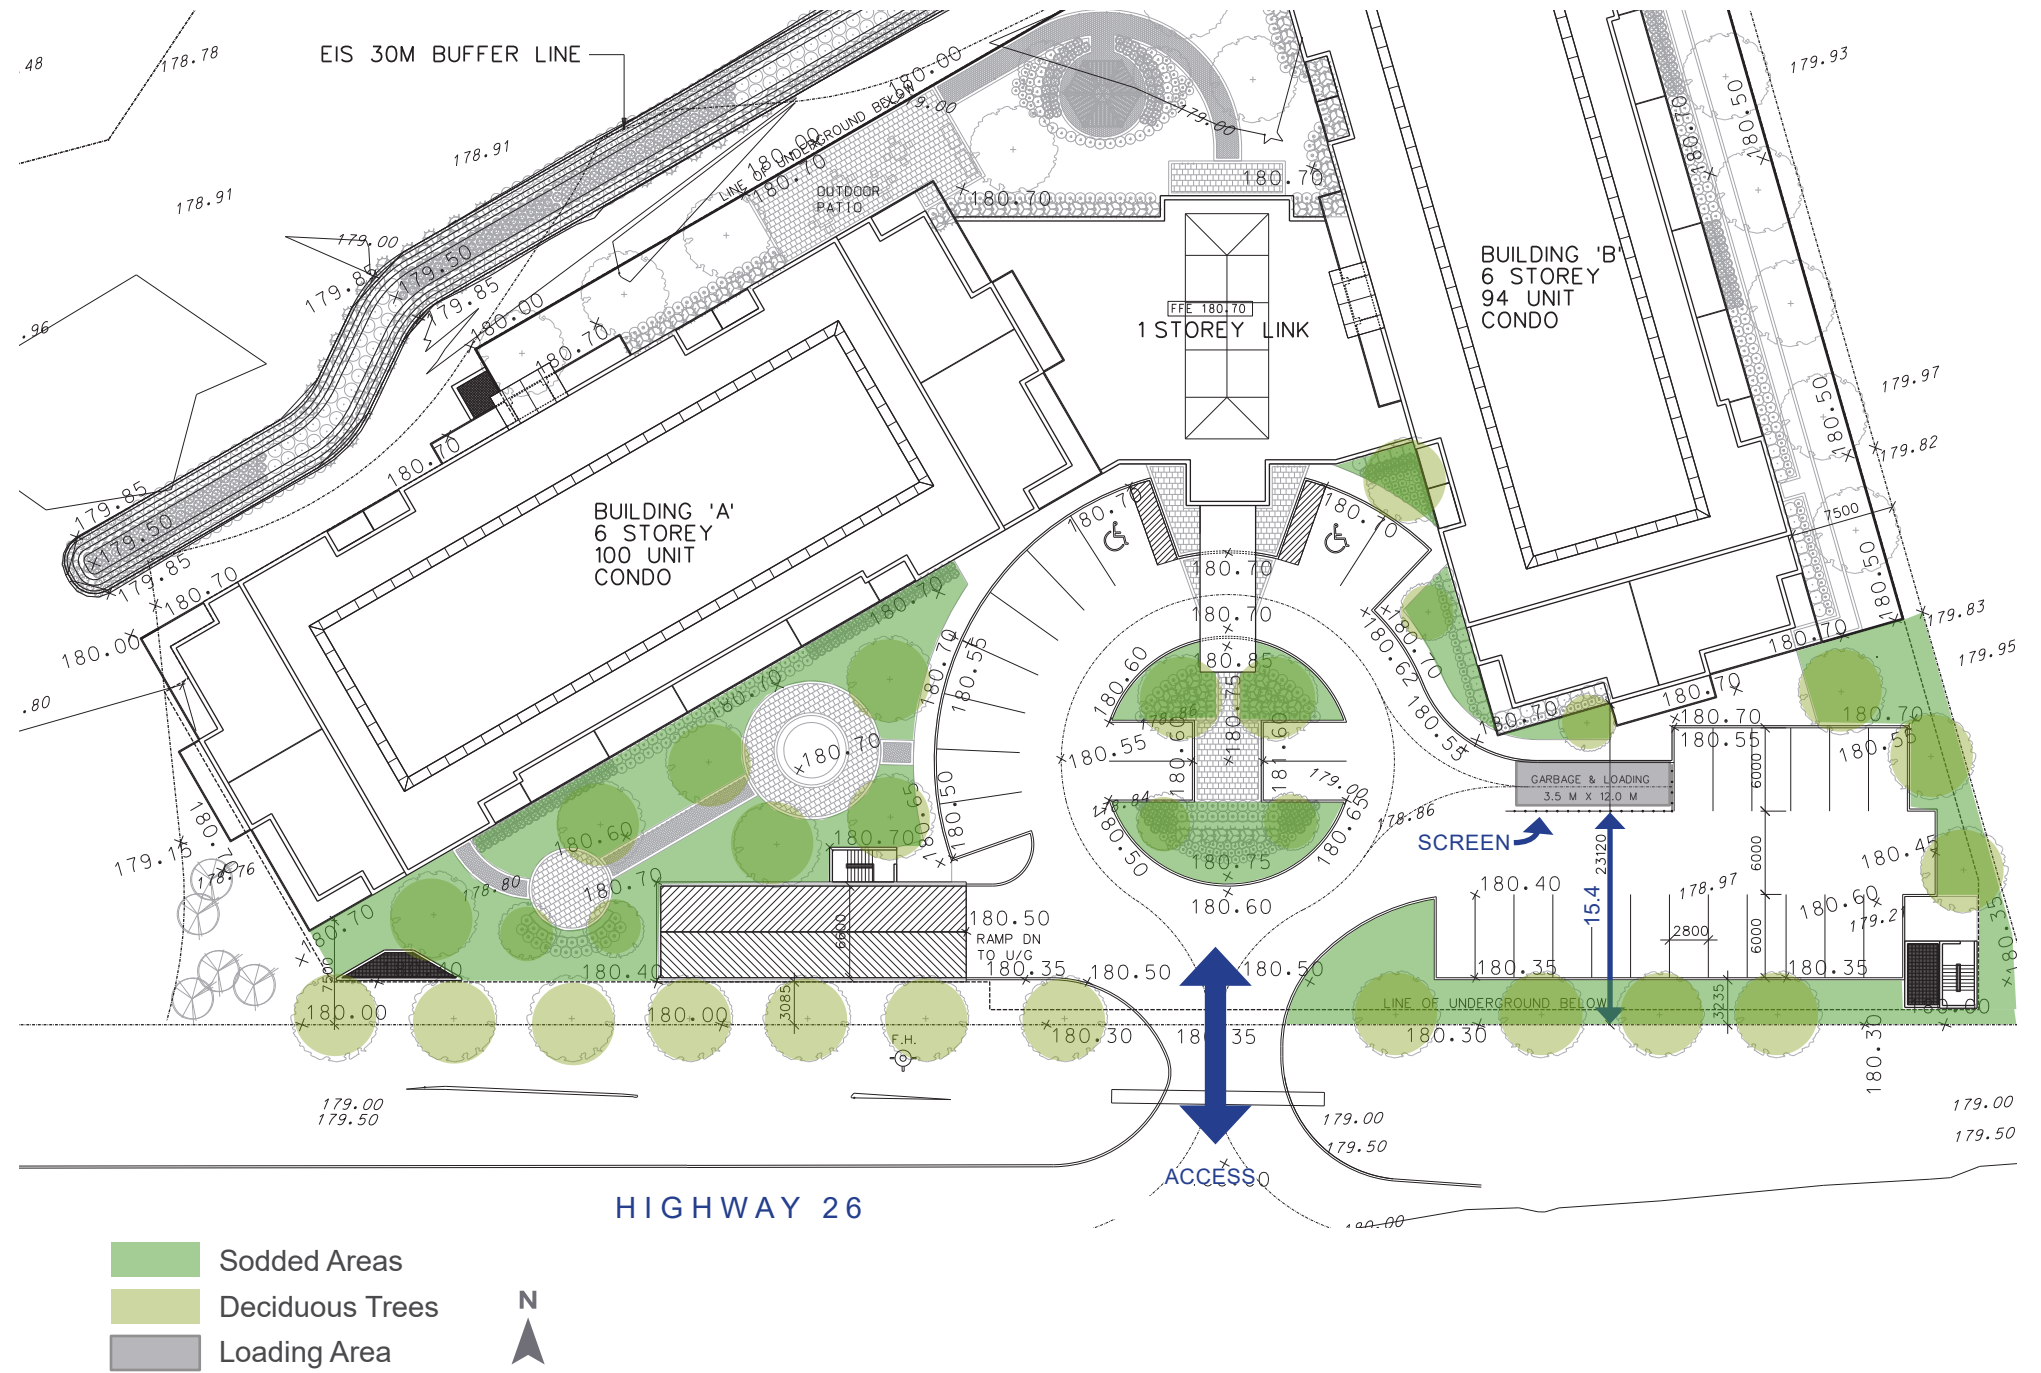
Surface parking and loading area diagram based on Site Plan prepared by Arsenault Architect Inc., annotated by Weston Consulting
